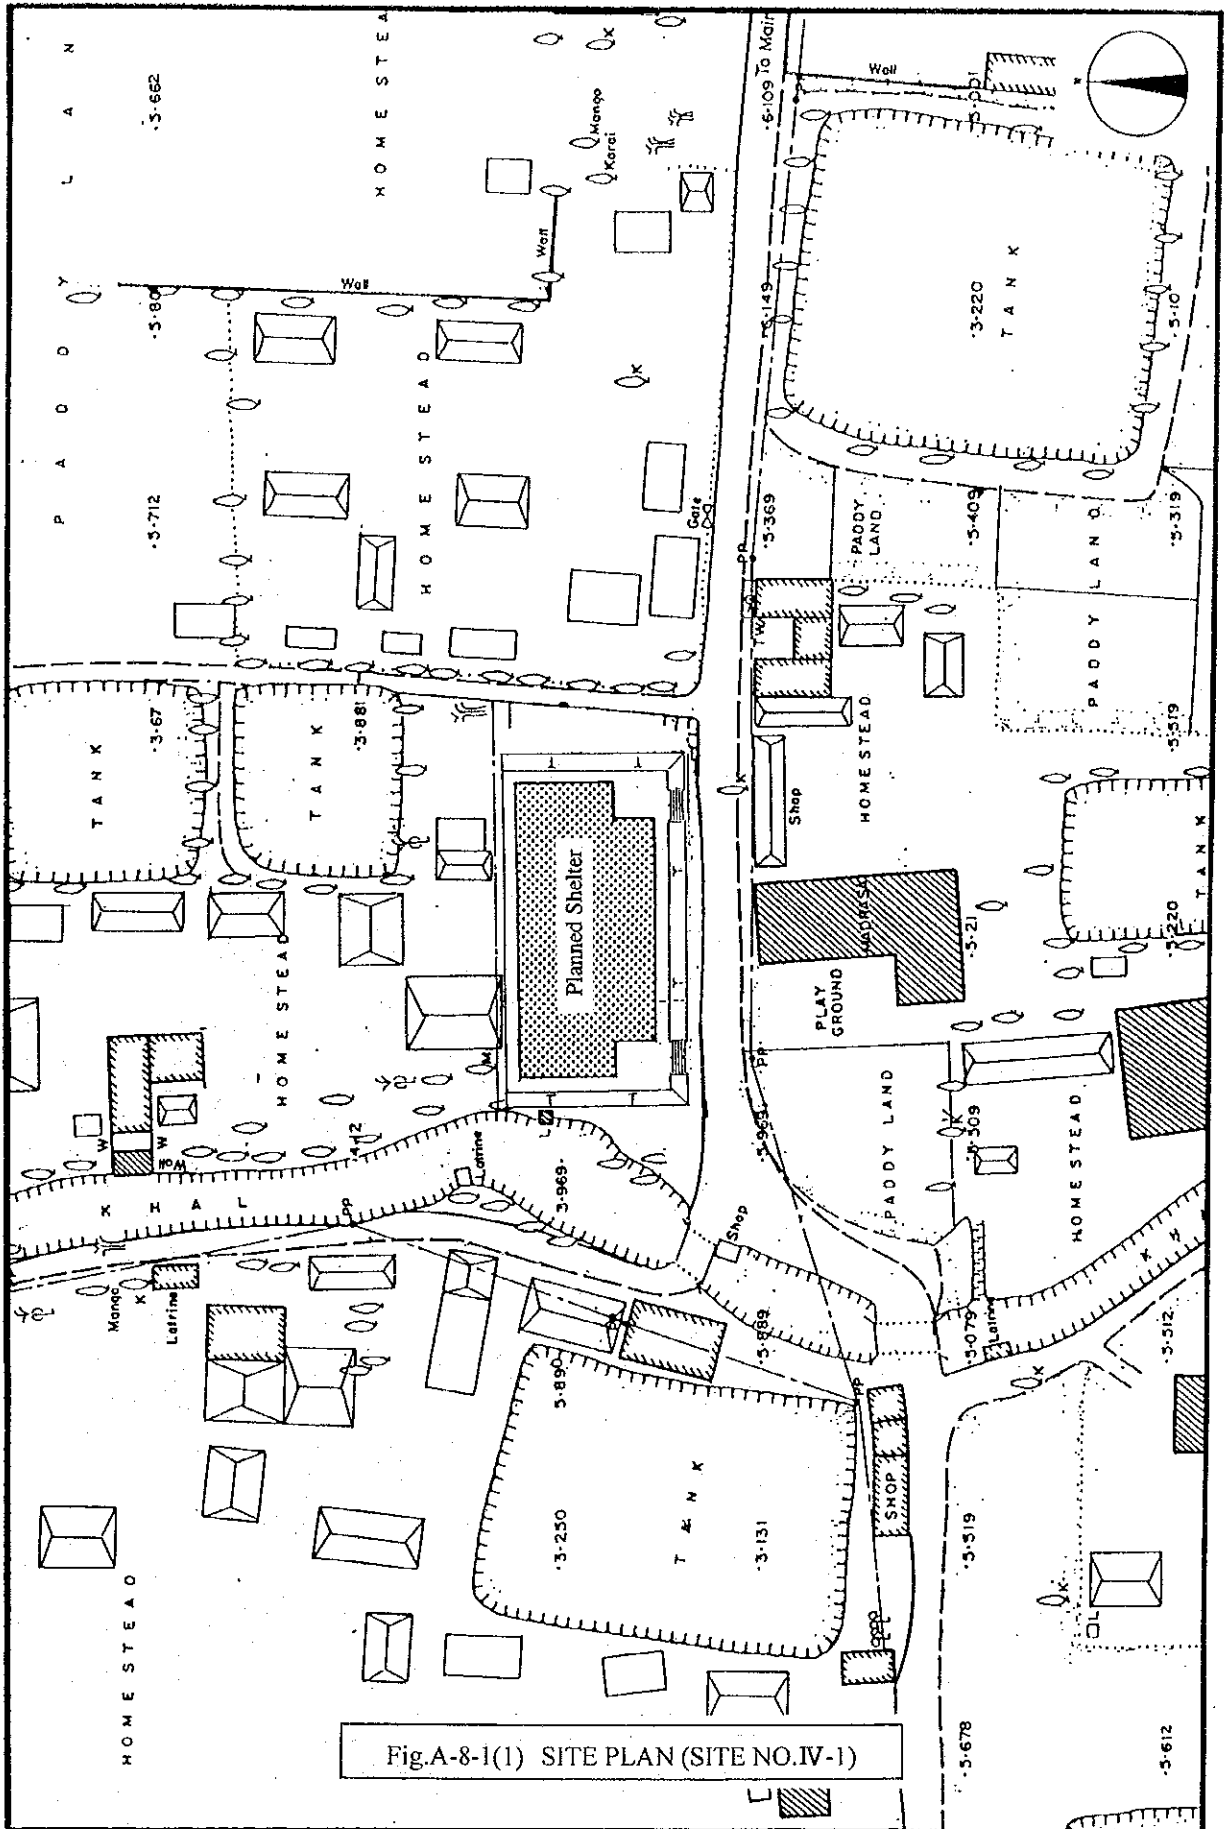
(1) SITE PLAN (SITE NO.IV-1)
